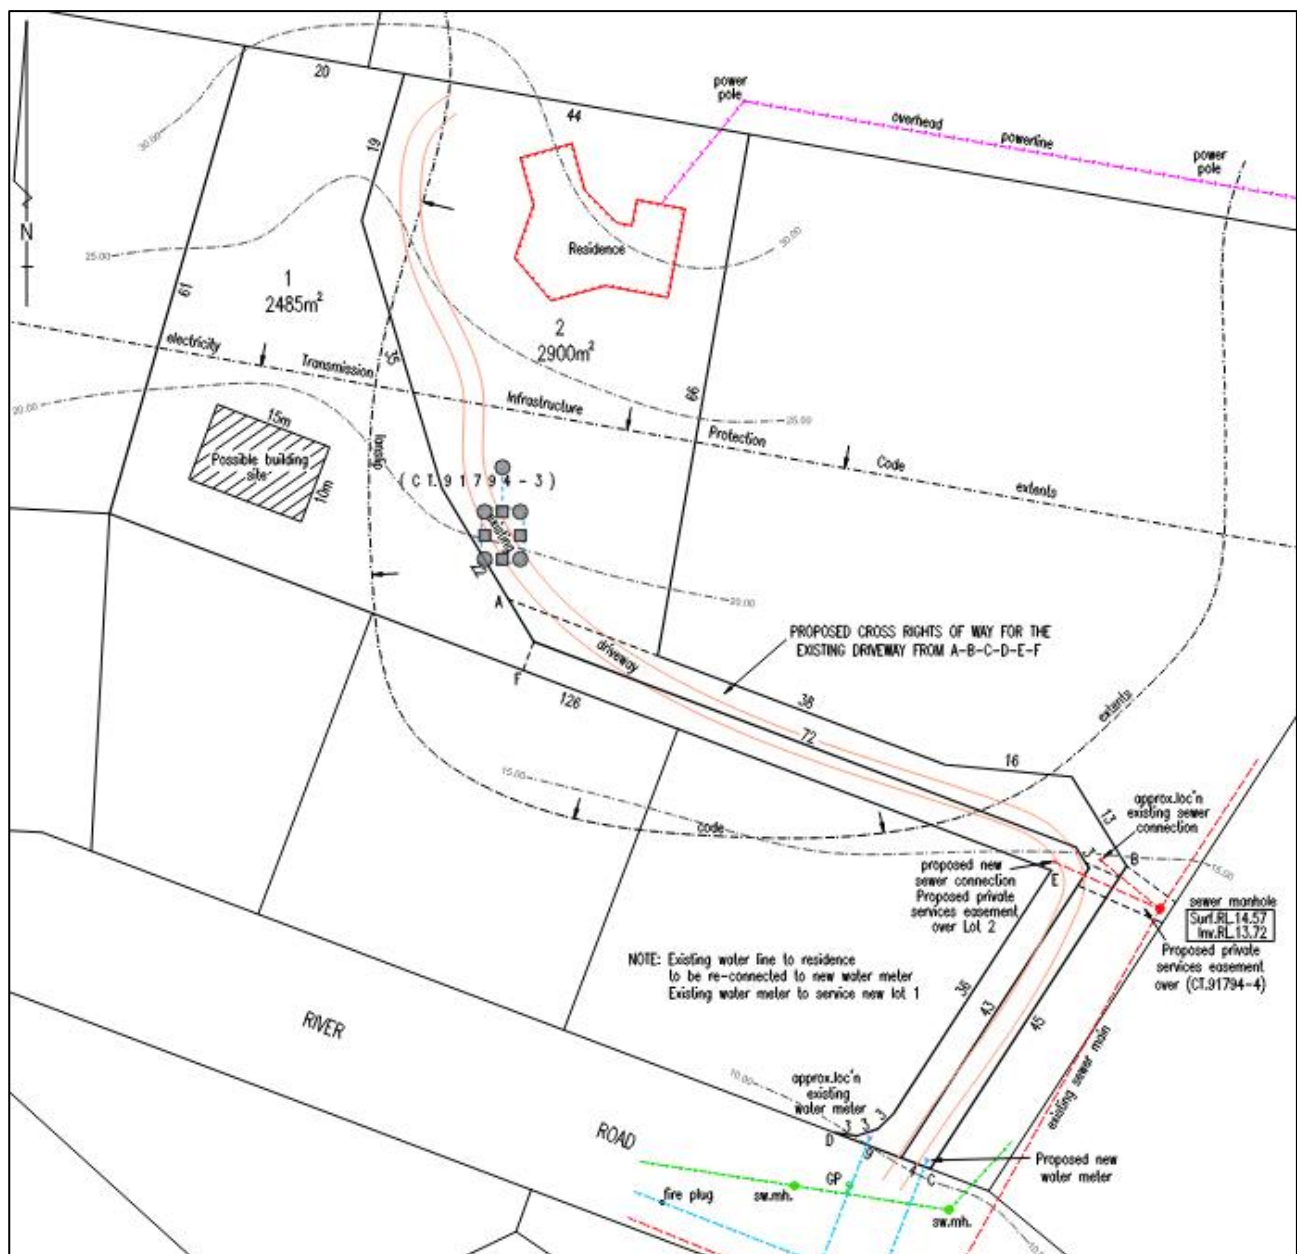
Subdivision plan (Michell Hodgetts, 2023)
